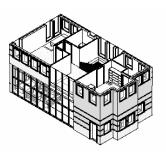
Architectural Space or Rooms Representations (2<sup>nd</sup> floor)
